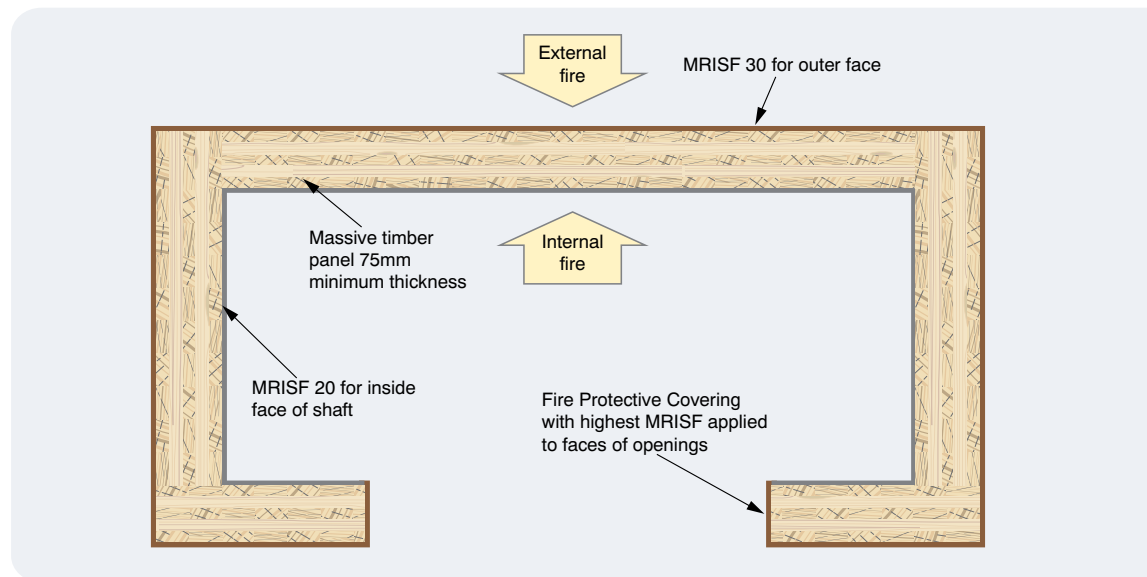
MRISF requirements for typical stair and lift shaft construction for single skin massive timber panel construction.
